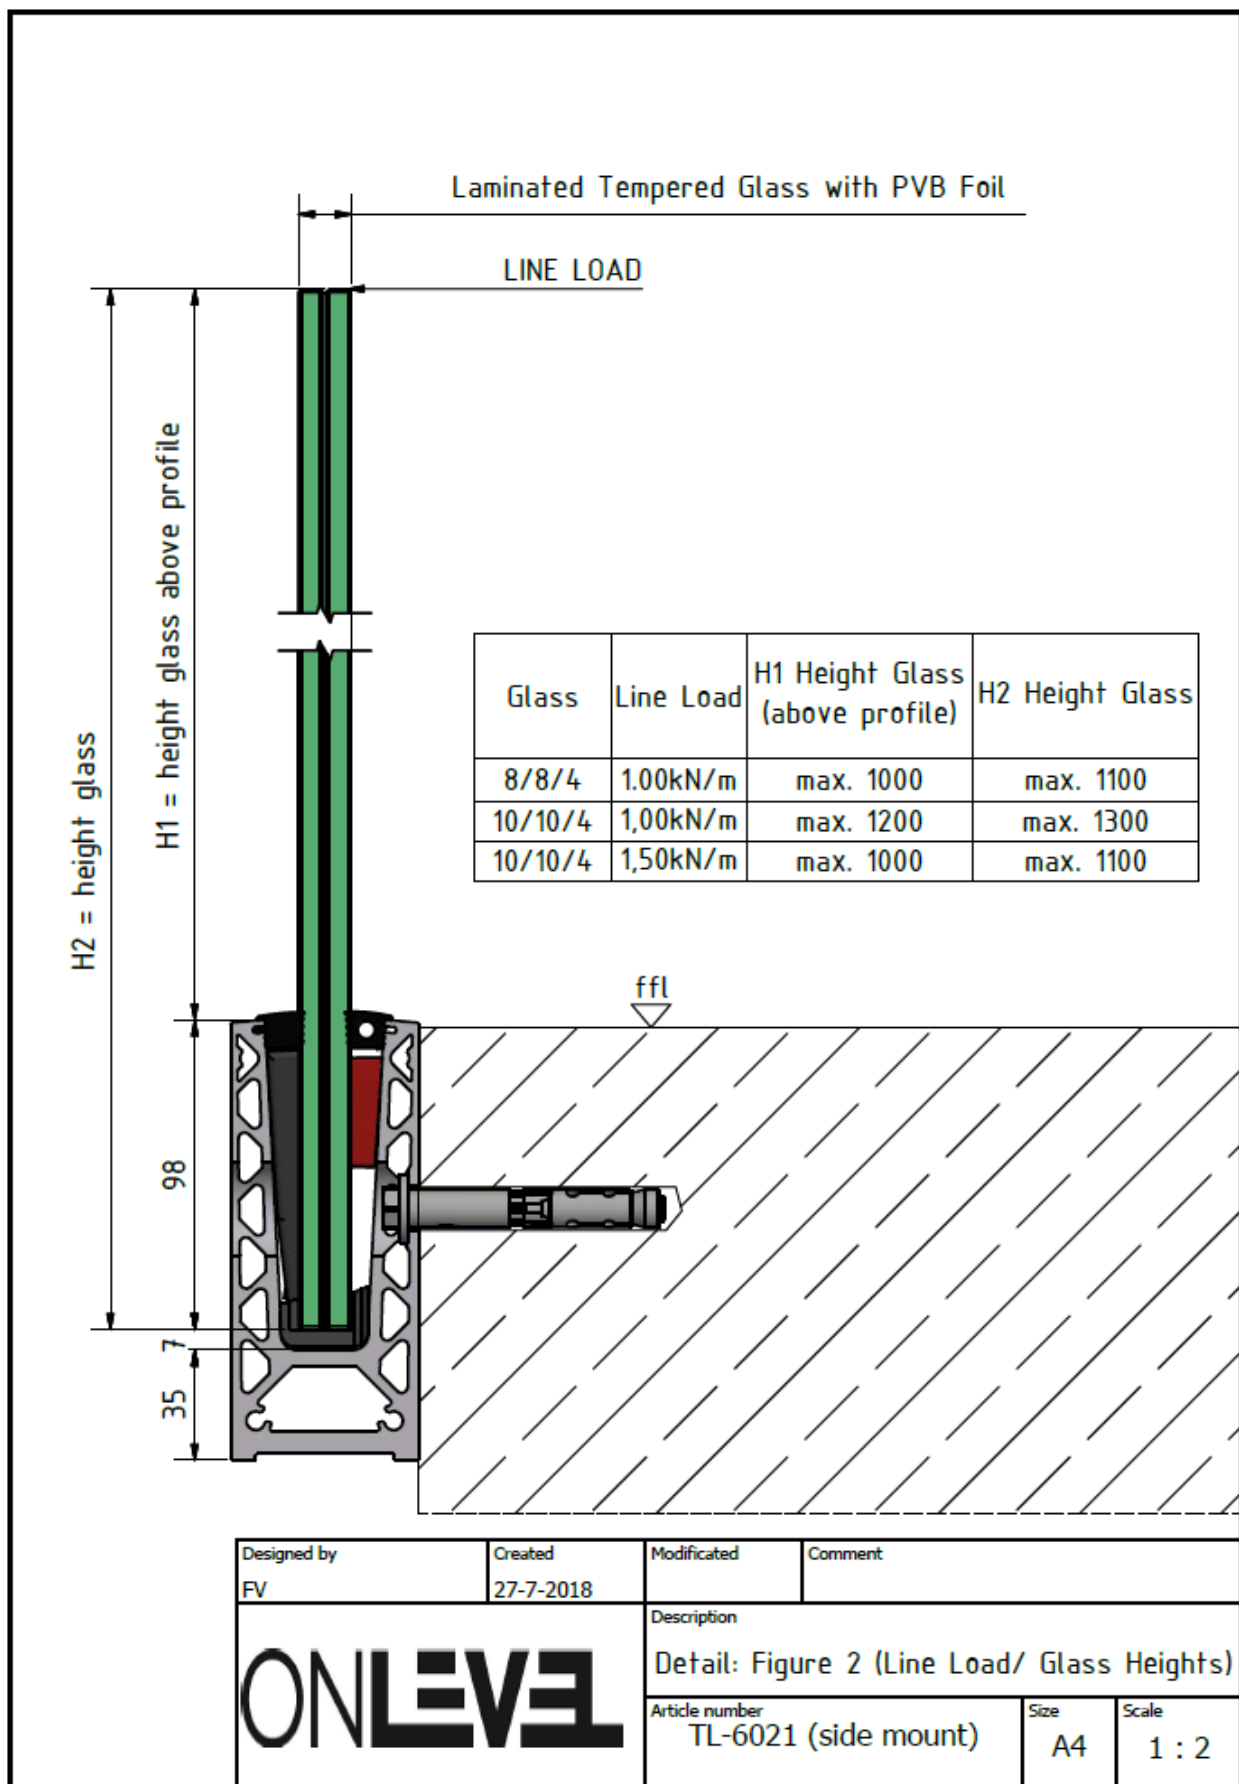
6. Product drawing from OnLevel for profile 6021 Side Mount – 1.5 kN/m, sheet 2 of 4.
